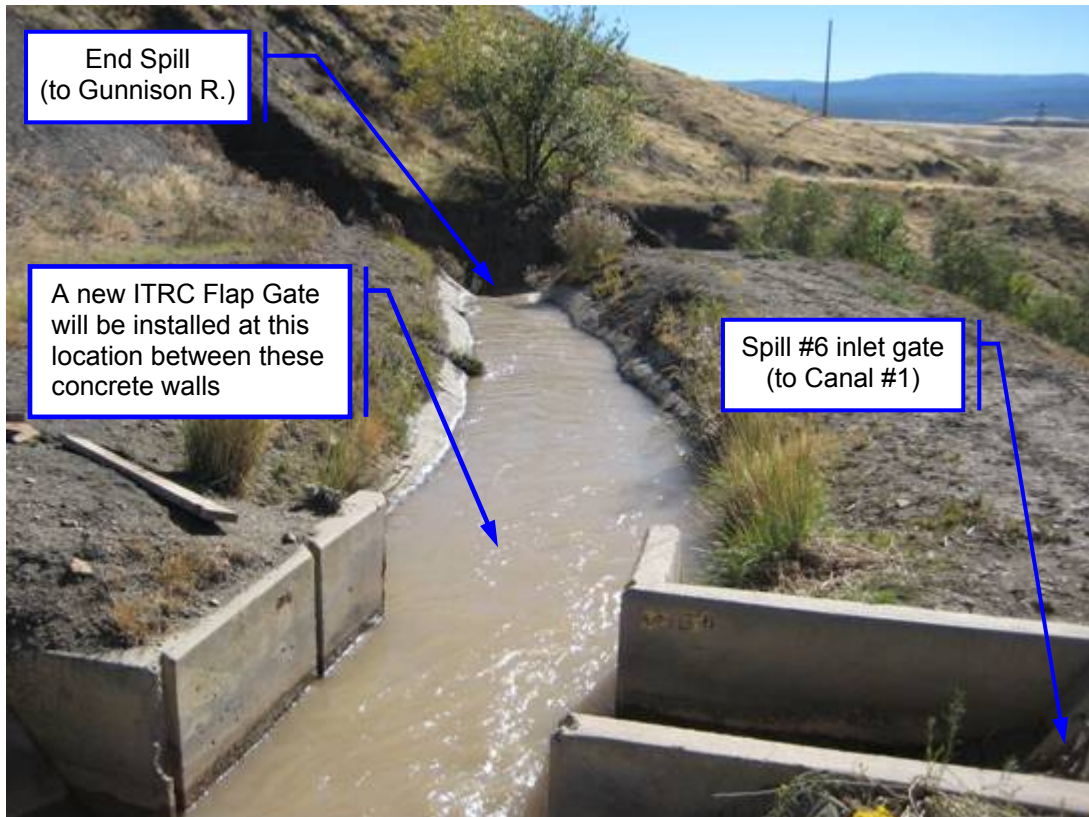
End of Canal #2 upstream of spill outlet to the Gunnison River
